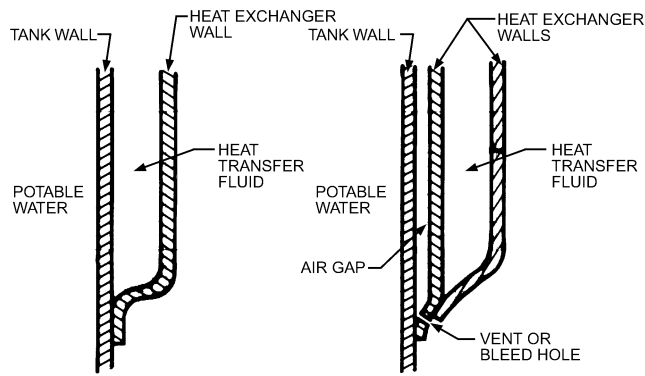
Cross Section of Wraparound Shell Heat Exchangers
